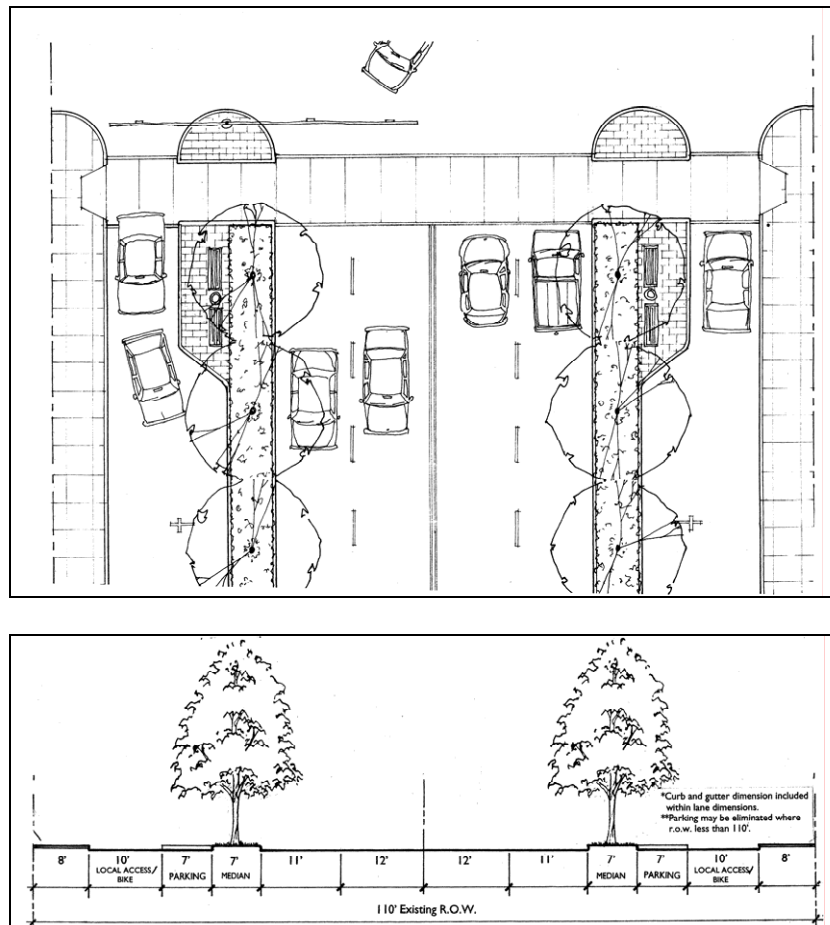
Multi-way boulevard configuration provides “local-access lanes” with on-street parking, reducing access conflicts between through-traffic, local traffic, and pedestrians.
